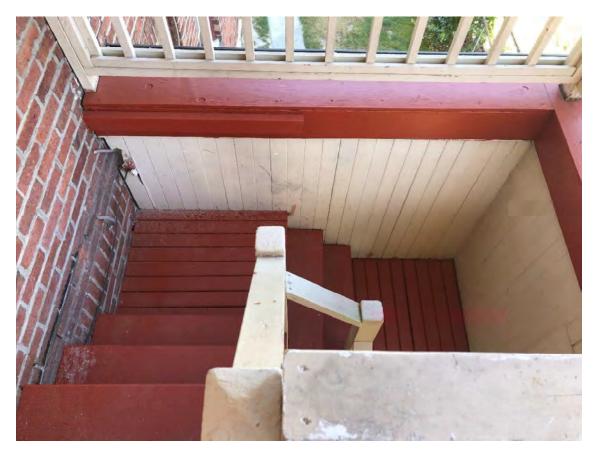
B (After). Rear egress porch, stair down from Second Floor landing, looking north, August 2020. Source: Stephen Day Architecture.
